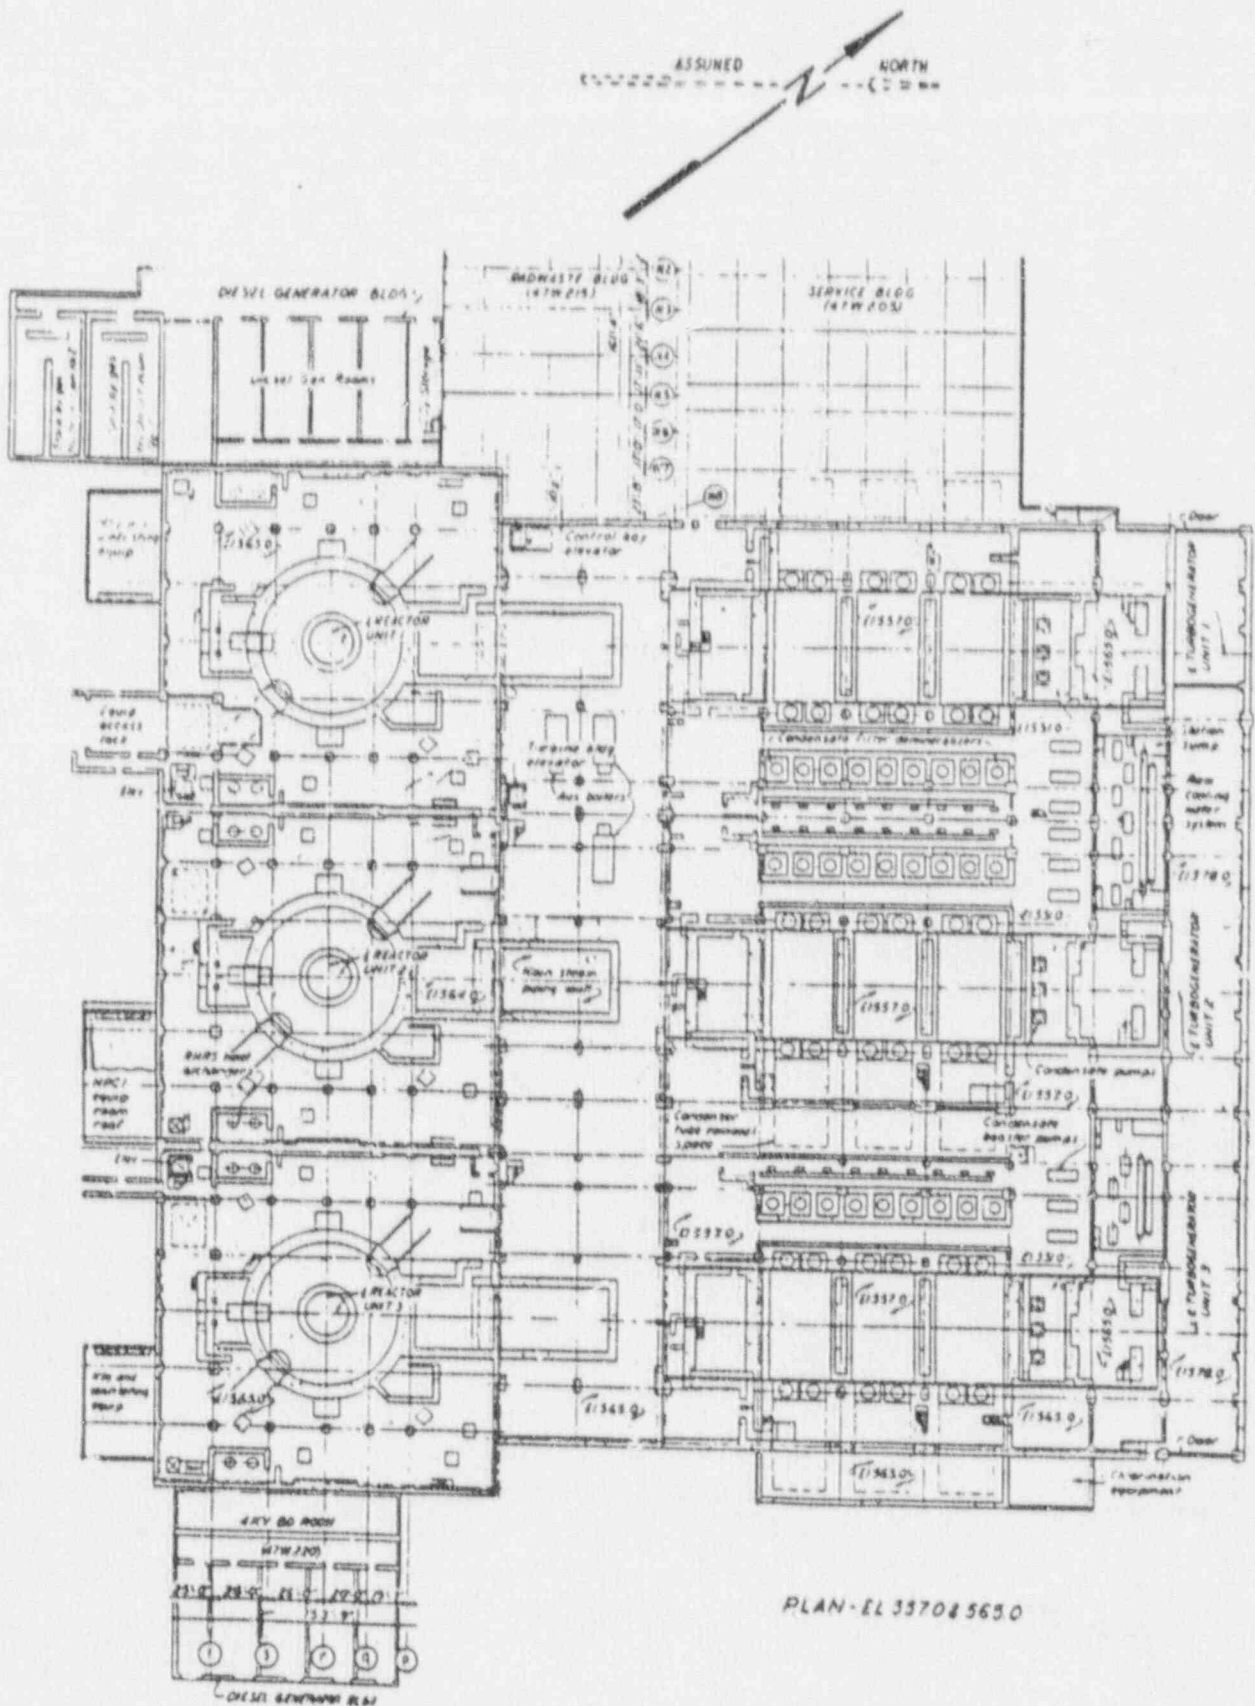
Overall Layout of the Browns Ferry Nuclear Plant, Elevations 557 ft. (Turbine Building) and 565 ft. (Reactor Building)
